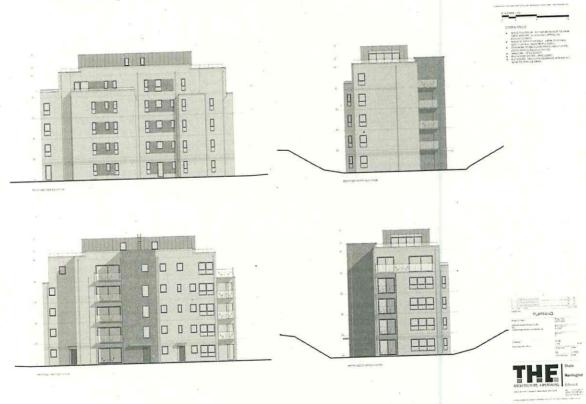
Proposed elevations of the South Groathill Road development (Source: THE Architecture & Planning)
